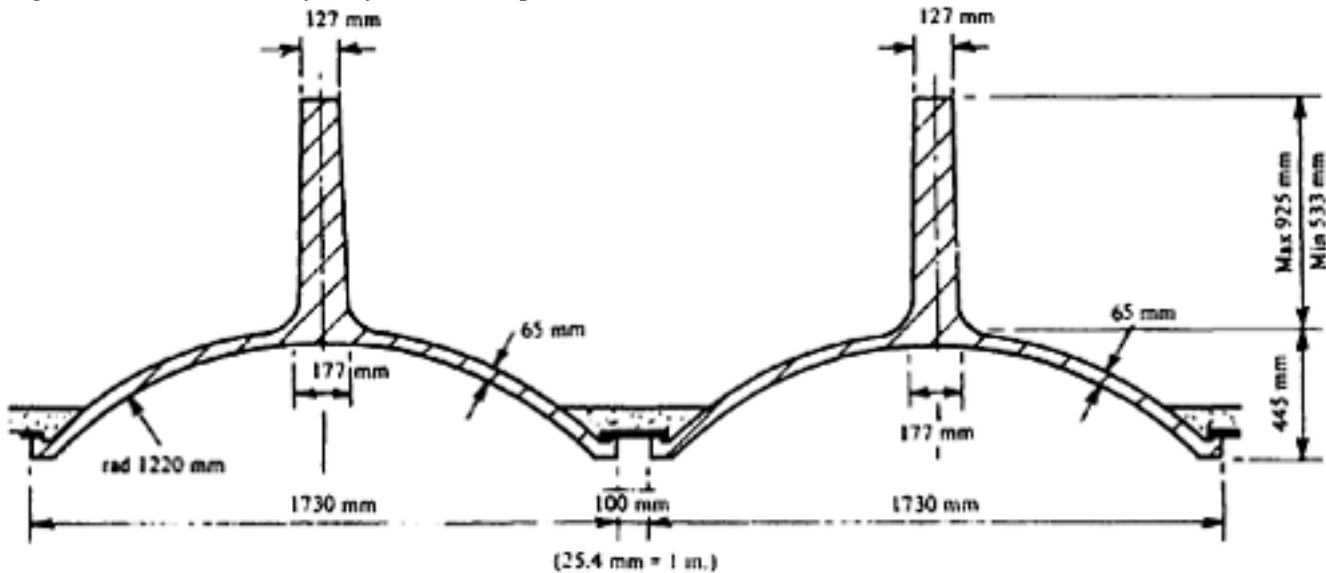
Cross-section of roof construction (example 9.2.8)
